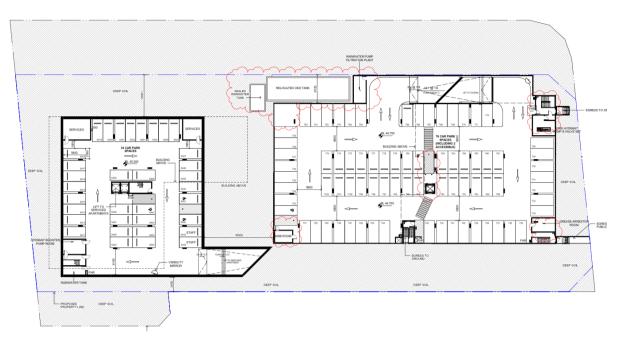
Proposed Modified Basement 1 Plan – DA-698/2019/A
